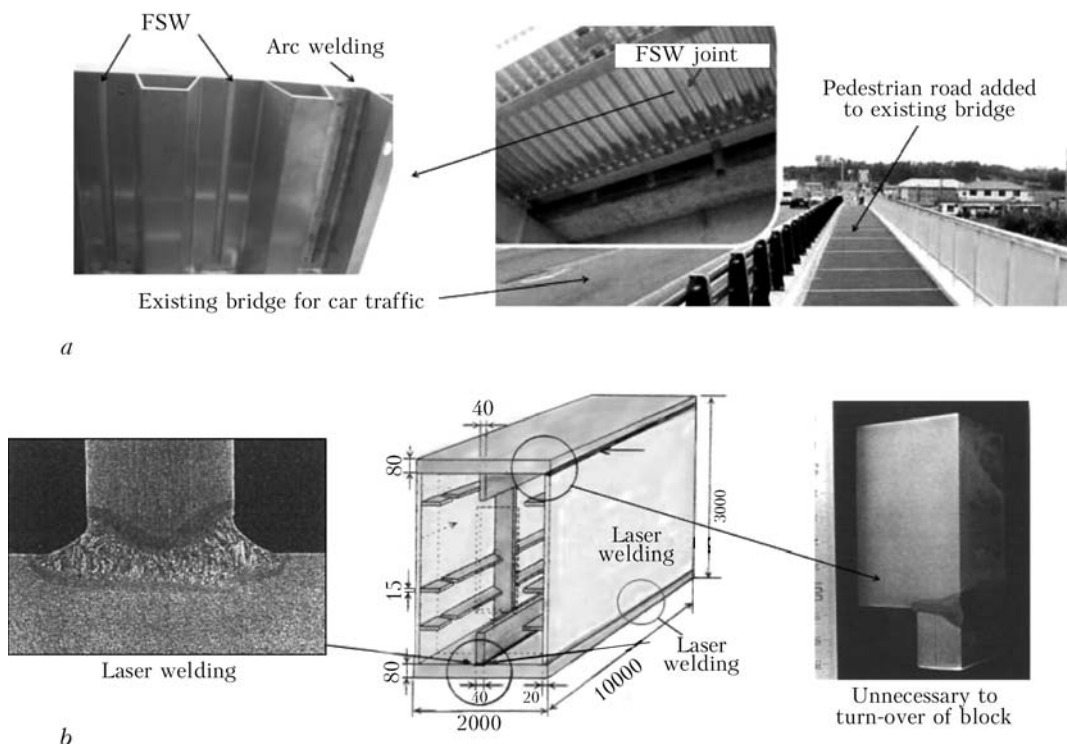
Employment of FSW for bridge member and a planed concept of laser welding of bridge member: *a* — FSW of bridge member; *b* — laser welding of bridge member
